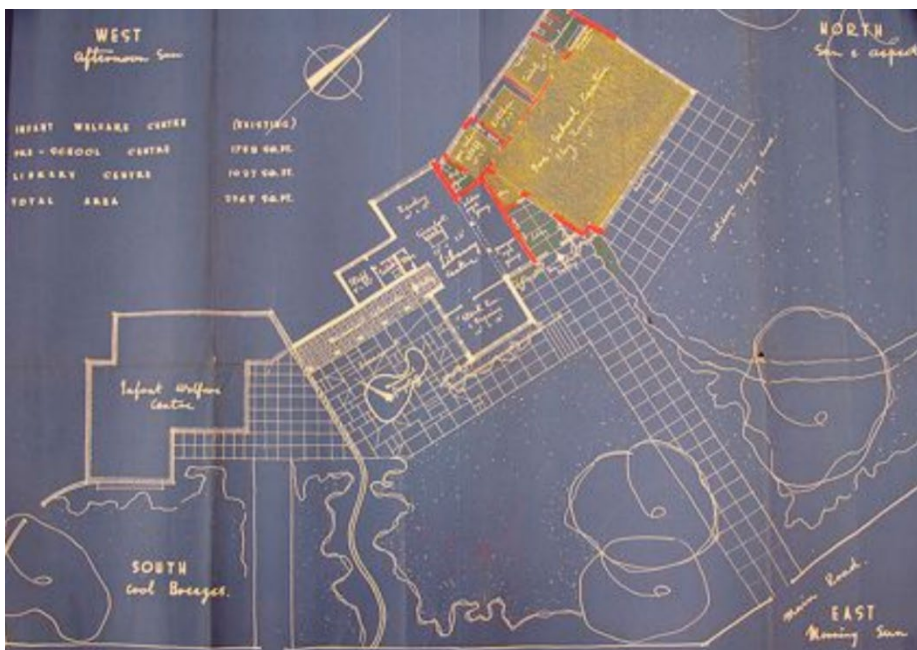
Sketch site plan c.1953, showing the spatial relationship of the Infant Welfare Centre, Children's Library and Pre-school. (Source: Public Building Plans File No.5841 Plan No.4057, Unit 413, VRPS 8044, PROV, cited in Mills and Westbrooke 2010:12)
